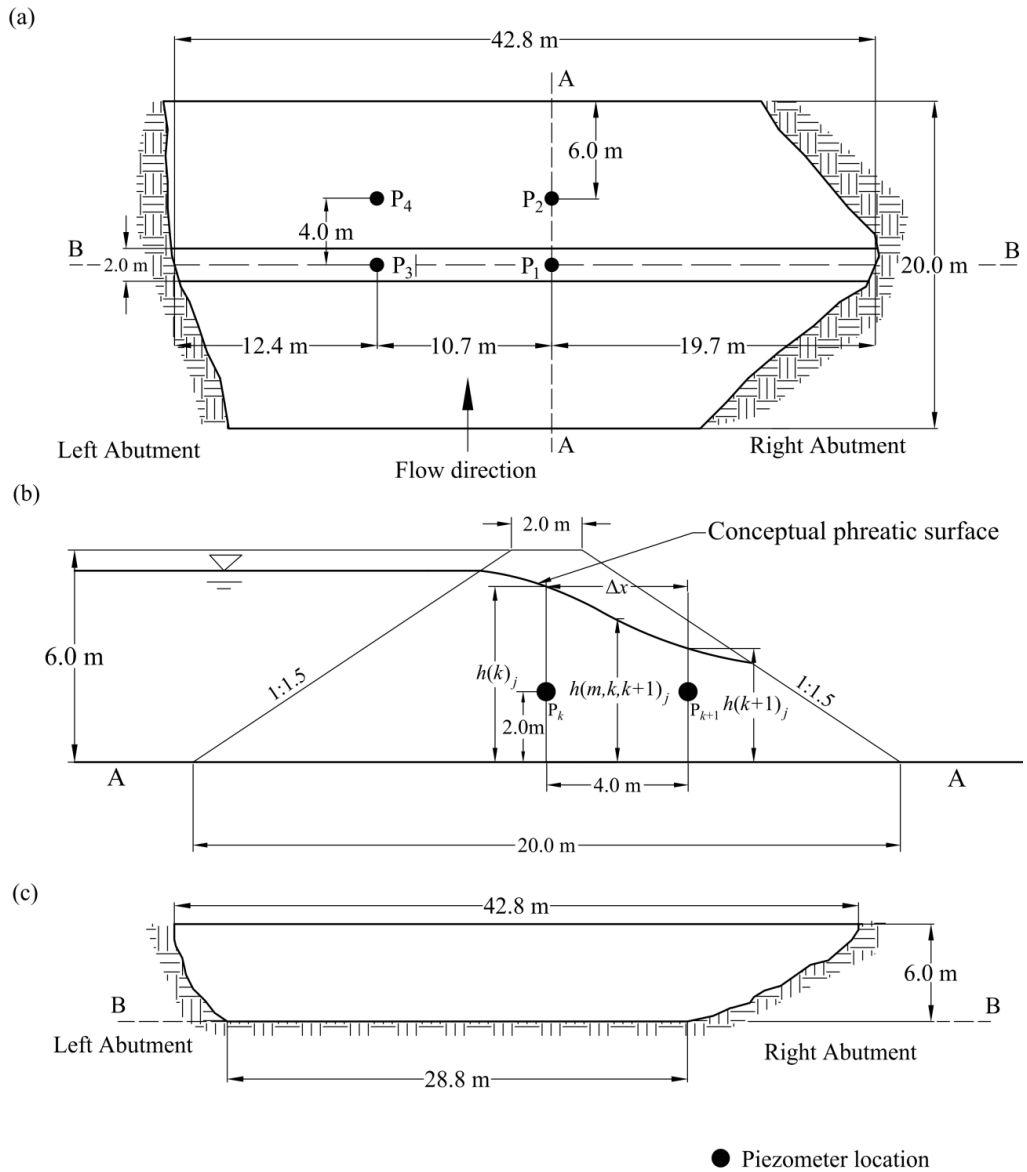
(a) Planar design details; (b) Cross-sectional design details (along axis A-A); (c) Longitudinal-sectional design details (along axis B-B) of the 6 m high test rockfill dam (M1).
